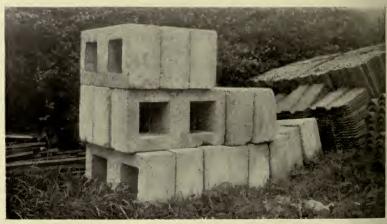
Concrete blocks used in construction of the houses shown in Fig. 27 and Fig. 28.
